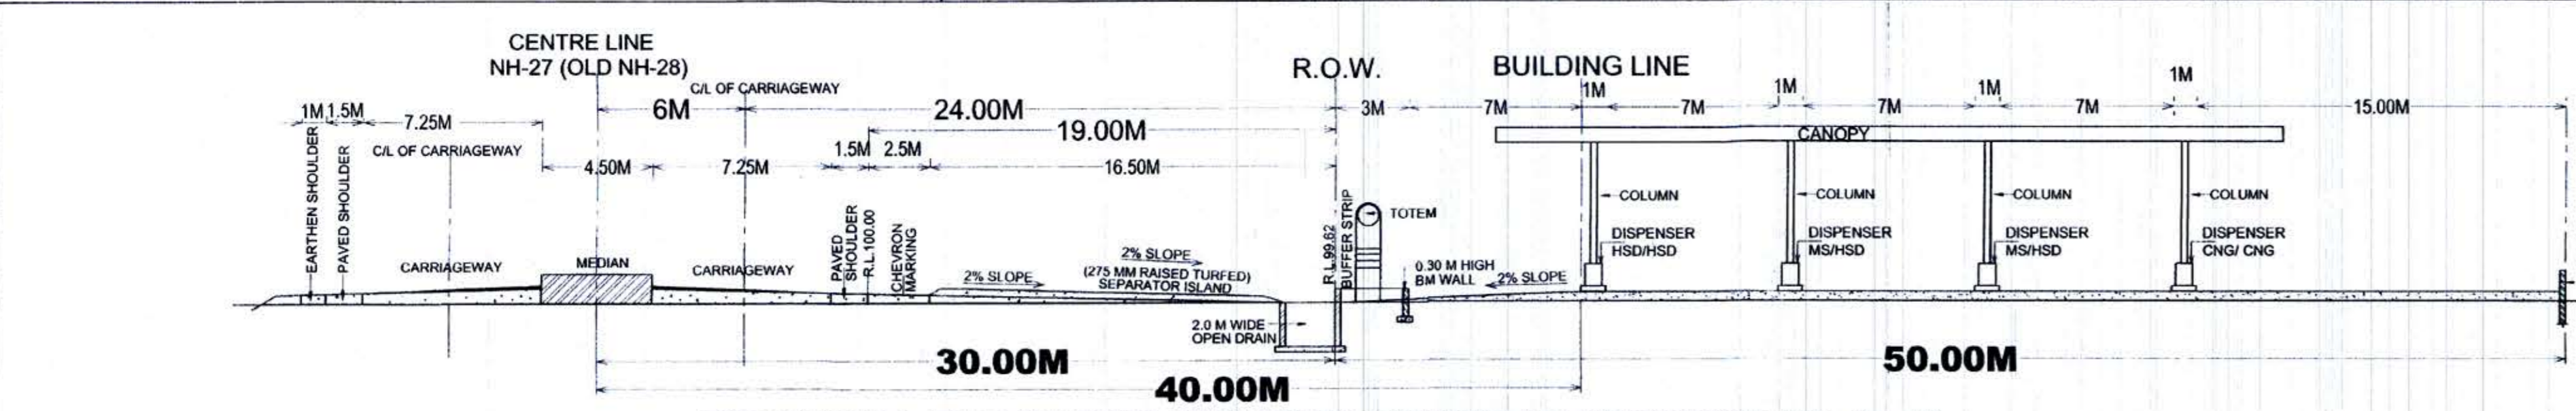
DETAIL SECTION OF DRIVEWAY/ APPROACH ROAD
